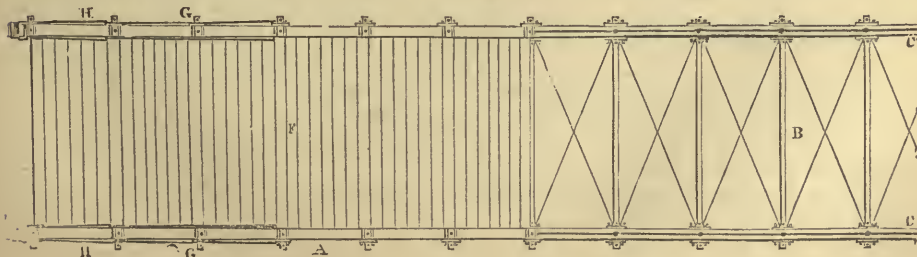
, is a perspective view of a part of Severson's Iron Bridge, near the abutment; it is cambered about 1 in 80 or 100—the whole combined forming a trussed girder. The sides or body of the truss, when made of cast-iron, will be composed of pieces, or voussoirs, corresponding in all parts with the arc of a circle, having a verse sine of 1 to a chord of 80 or 100. The ends and joints between the voussoirs being radii, the main ties made of wire cables, and the lower and upper parts of the voussoirs, will form three concentric arcs.
